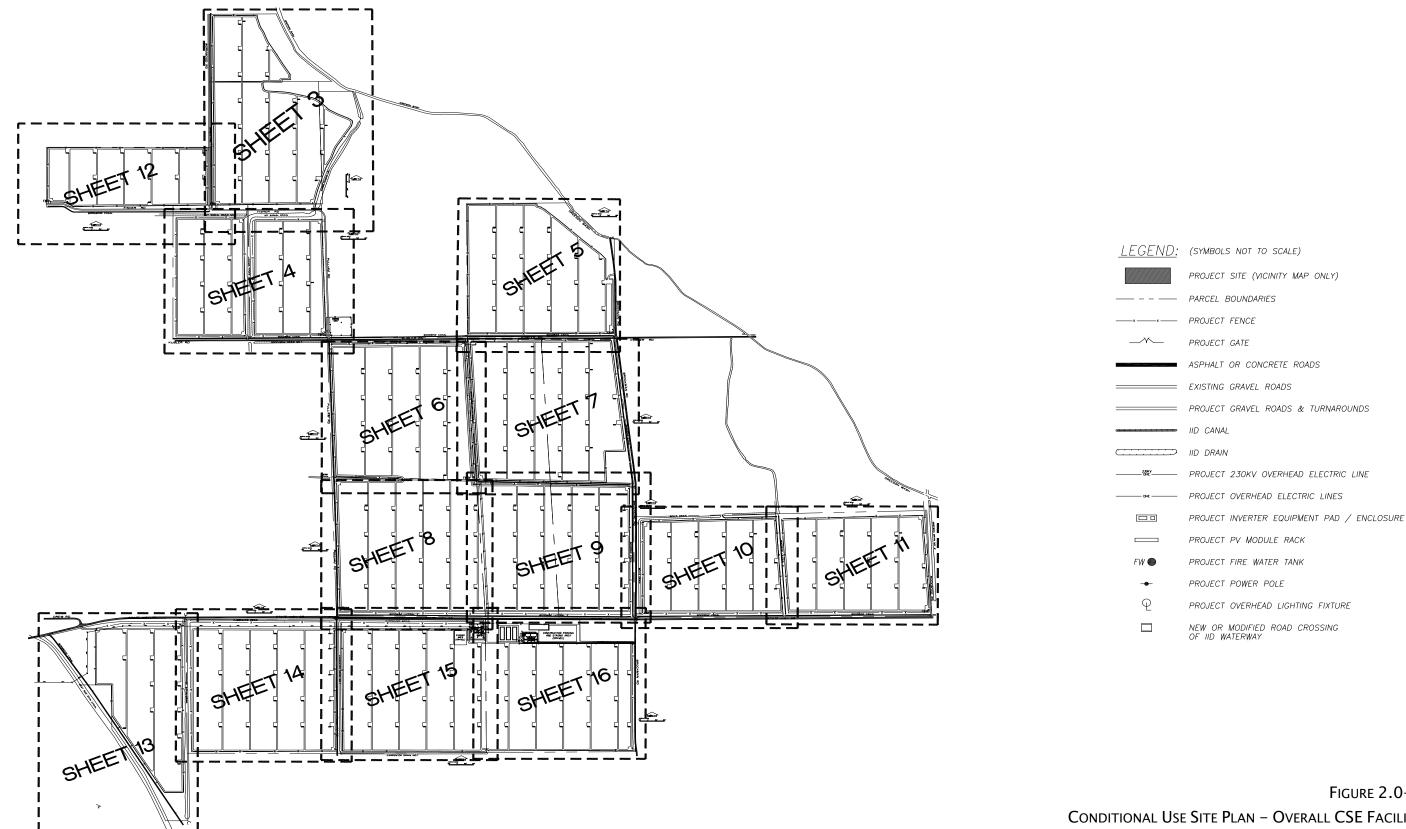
CONDITIONAL USE SITE PLAN - OVERALL CSE FACILITY
